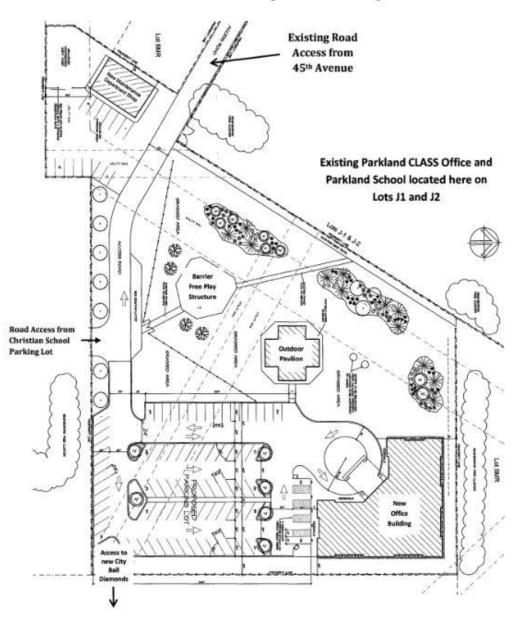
Parkland CLASS Proposed Site Development of Lot 4
